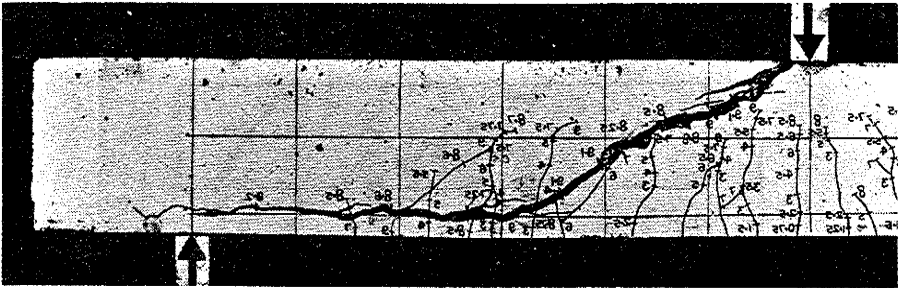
Diagonal tension failure of beam without web reinforcement (reproduced from TAYLOR [16]).
